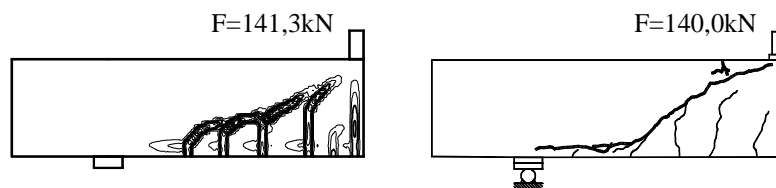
Crack propagation at failure of test beam 1K2 from Non-FEM and test
